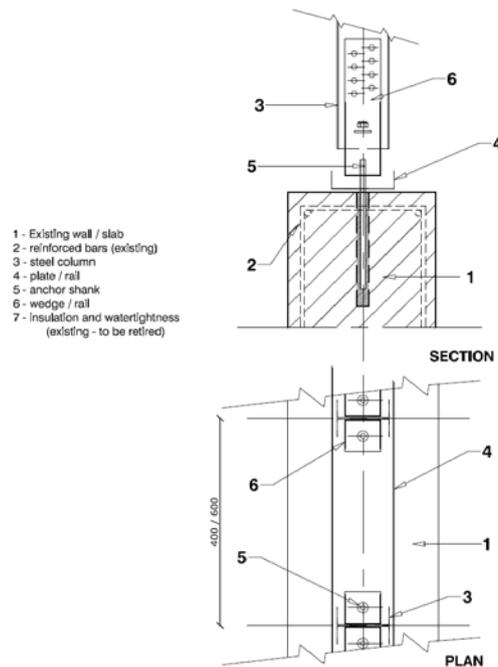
Continuous connection: one connection every 60 cm, U section bed, light gauge sections.
